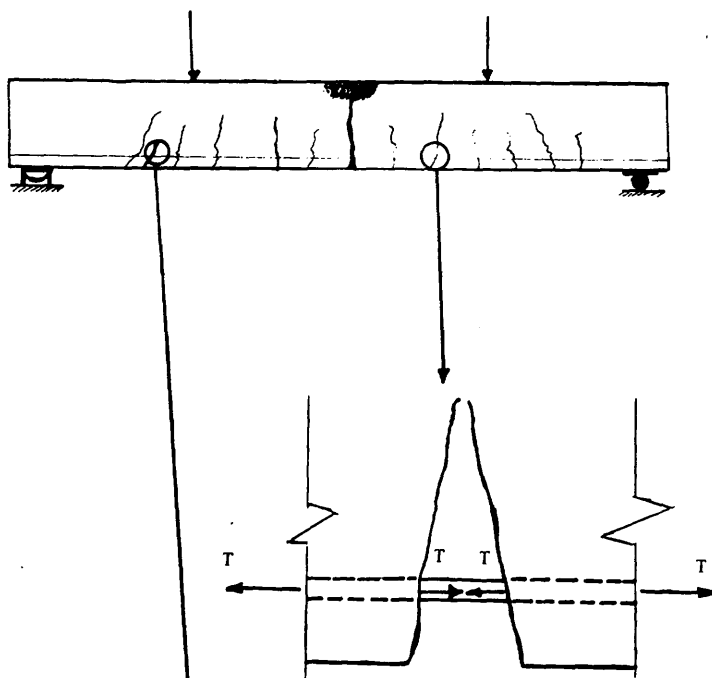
Tensile force across the crack carried out by reinforcement
